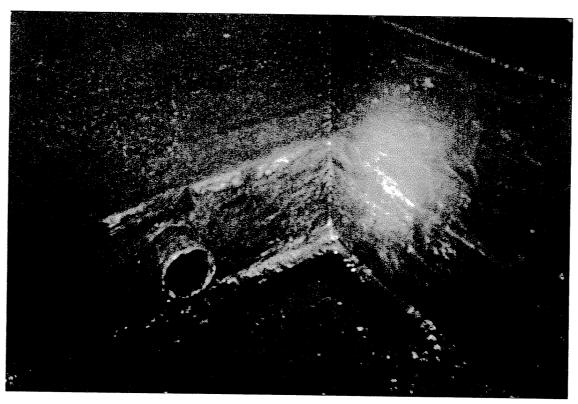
Walls and floor of the Shark Pit (Pit No. 8) coated with oil and grease. Also, groundwater infiltrating through several cracks.
